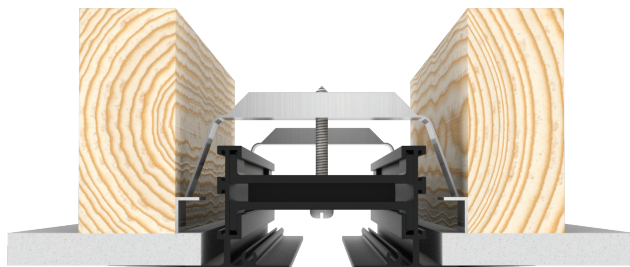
(Step 5A): Install Drywall – Exposed Face/Flange Border (A)
